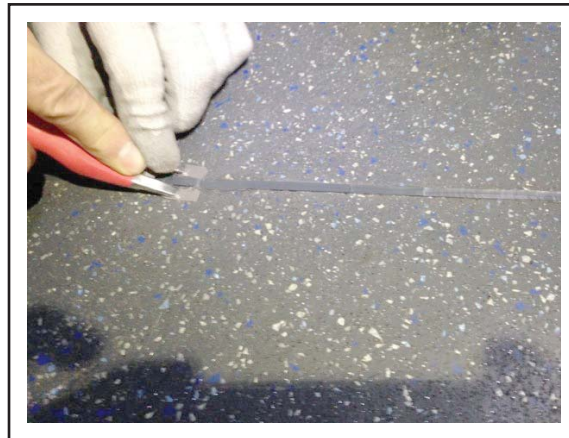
Trimming Using the Mozart Knife without the Attached Plate
